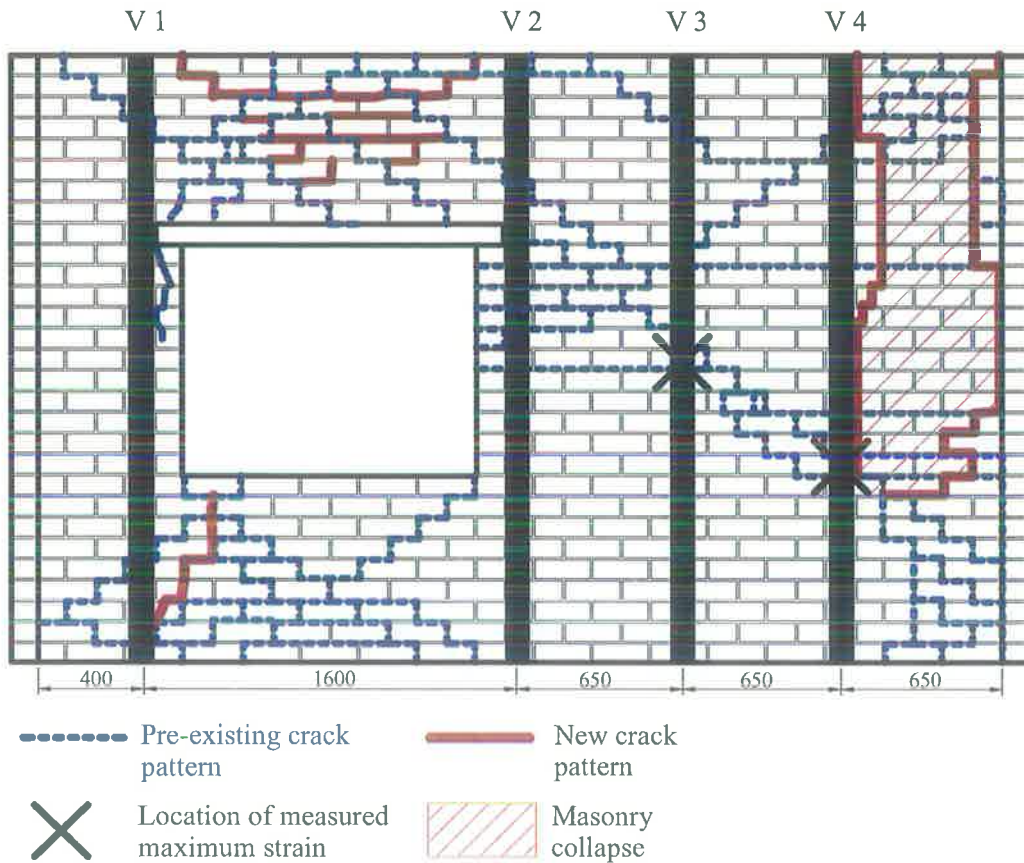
Schematic of cracking pattern and wall failure of Wall 2
